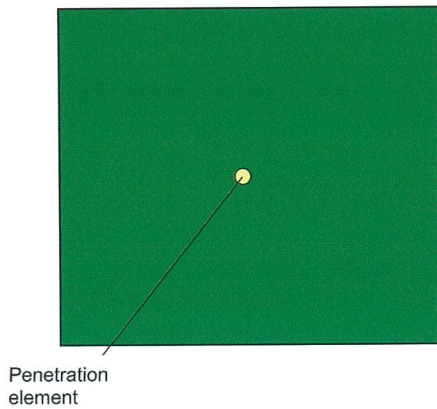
Sketch showing test for tightness (concrete slabs 20 x 20 x 10 cm)
